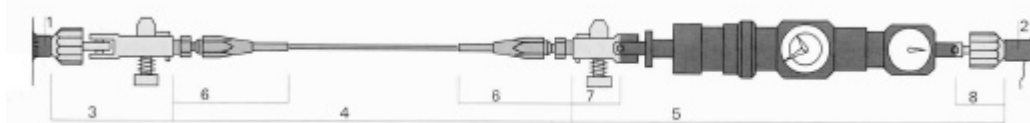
Distometer equipment ready for measurement: 1 Measuring rod, welded; 2 Measuring rod, concreted; 3 Articulated connection with clamp for wire couplings; 4 Invar wire; 5 Distometer ISETH; 6 Wire coupling; 7 Clamp for wire-coupling at distometer; 8 Articulated connection at distometer
